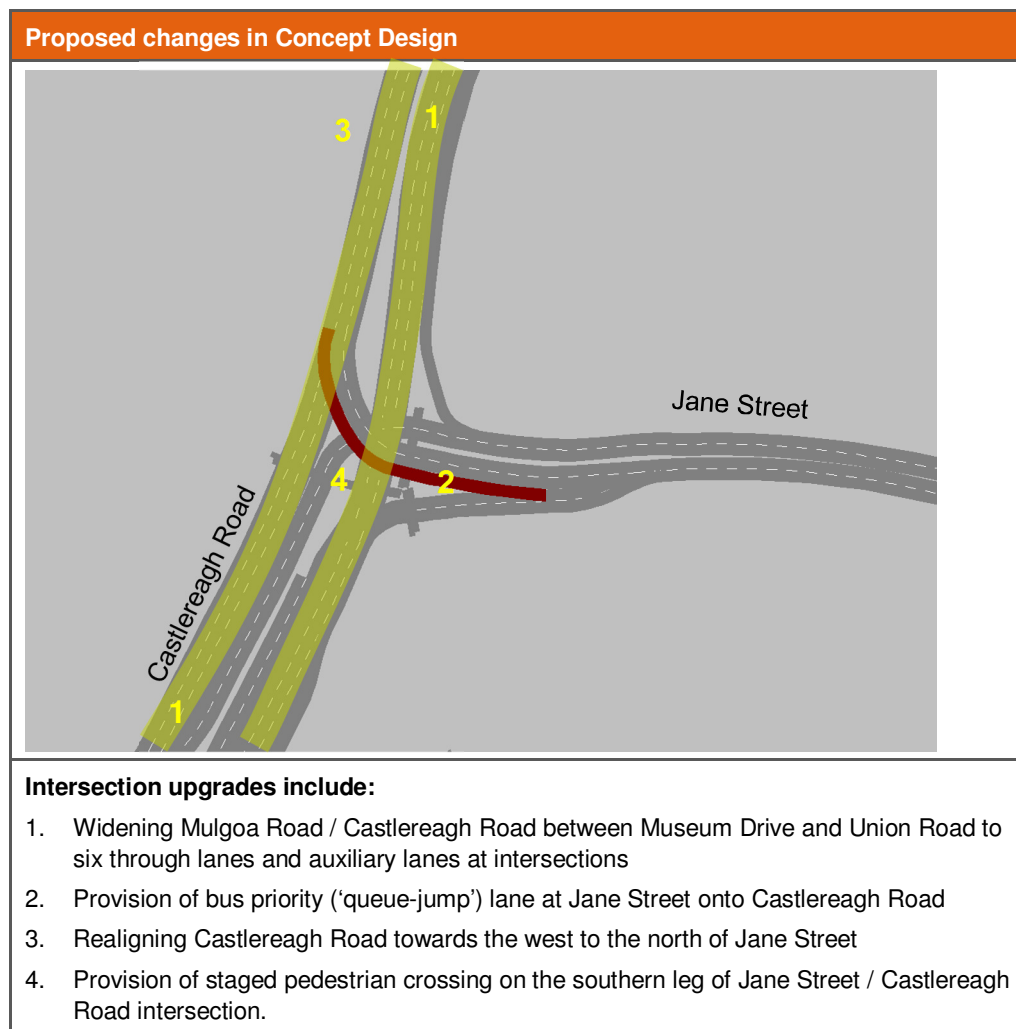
Proposed Layout of Jane Street/Castlereagh Road/Mulgoa Road Intersection
